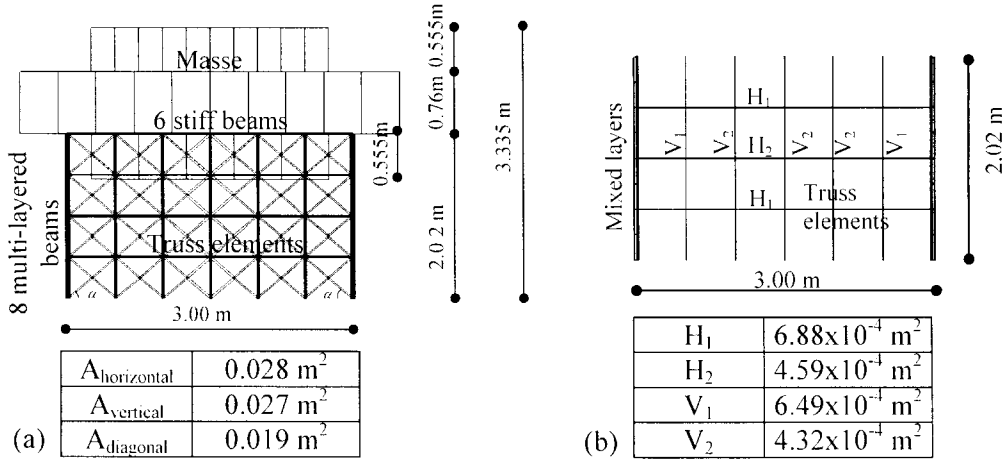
NUPEC test: (a) concrete mesh and section of truss elements; (b) steel mesh and section of truss elements.
